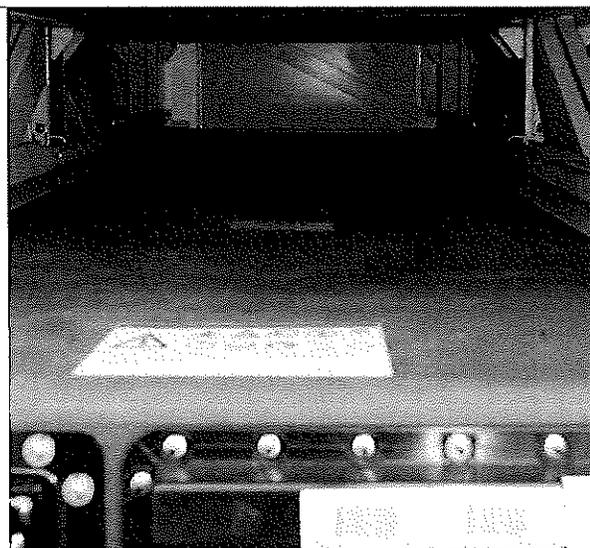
Condition of module below initiating module (R4M7) post-test
